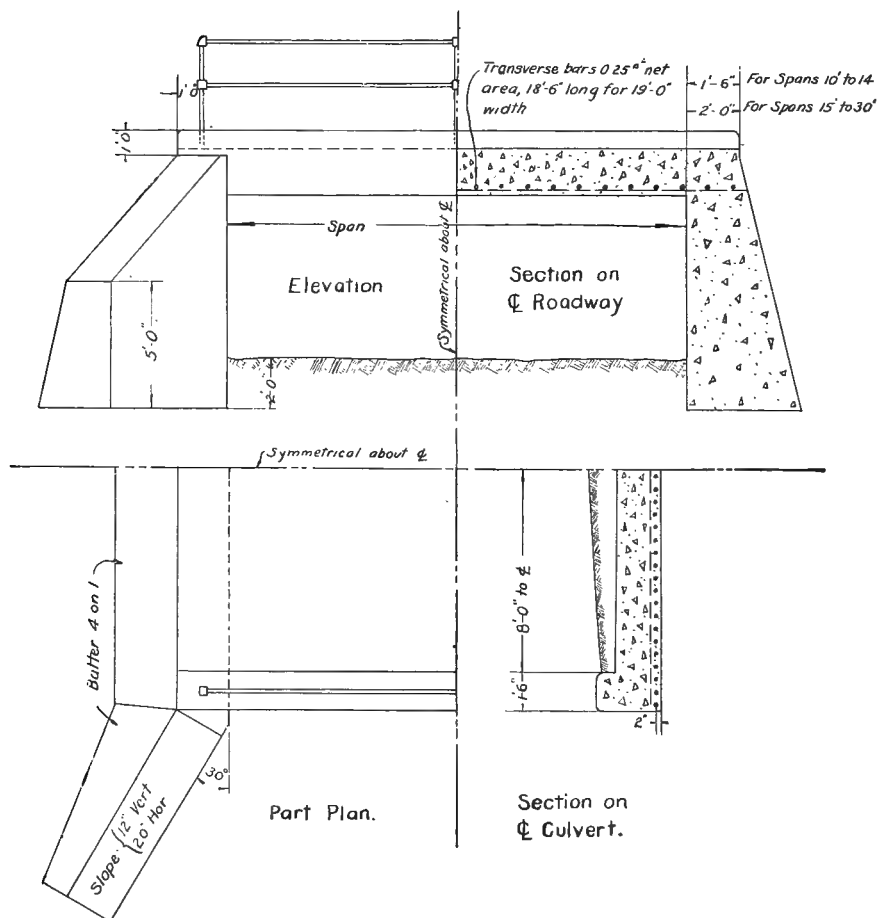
Standard culvert with rod reinforcement of 10 and 20-foot span. Designed by the Department of Highways of the State of New York.
